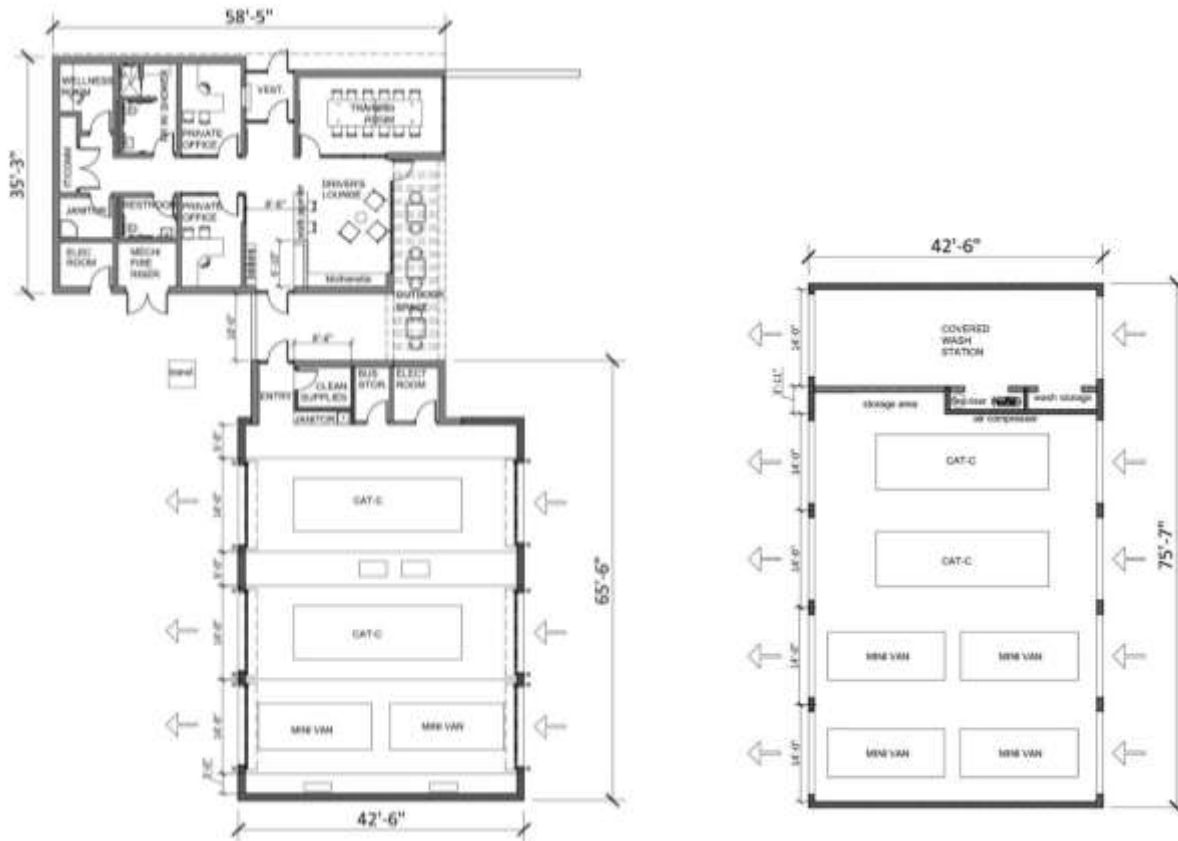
Alternative 2 Bus Barn, Bus Shelter and Administration Building Plans
